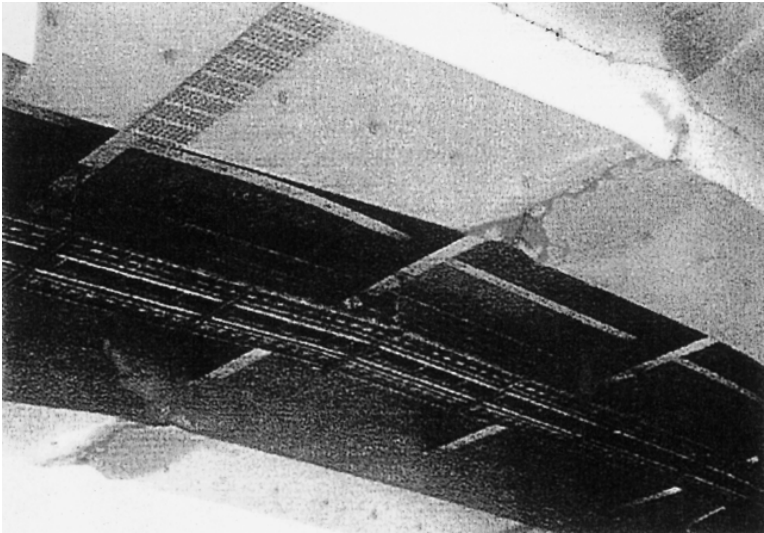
Buckling of Steel Box Girders at Mid-Section
